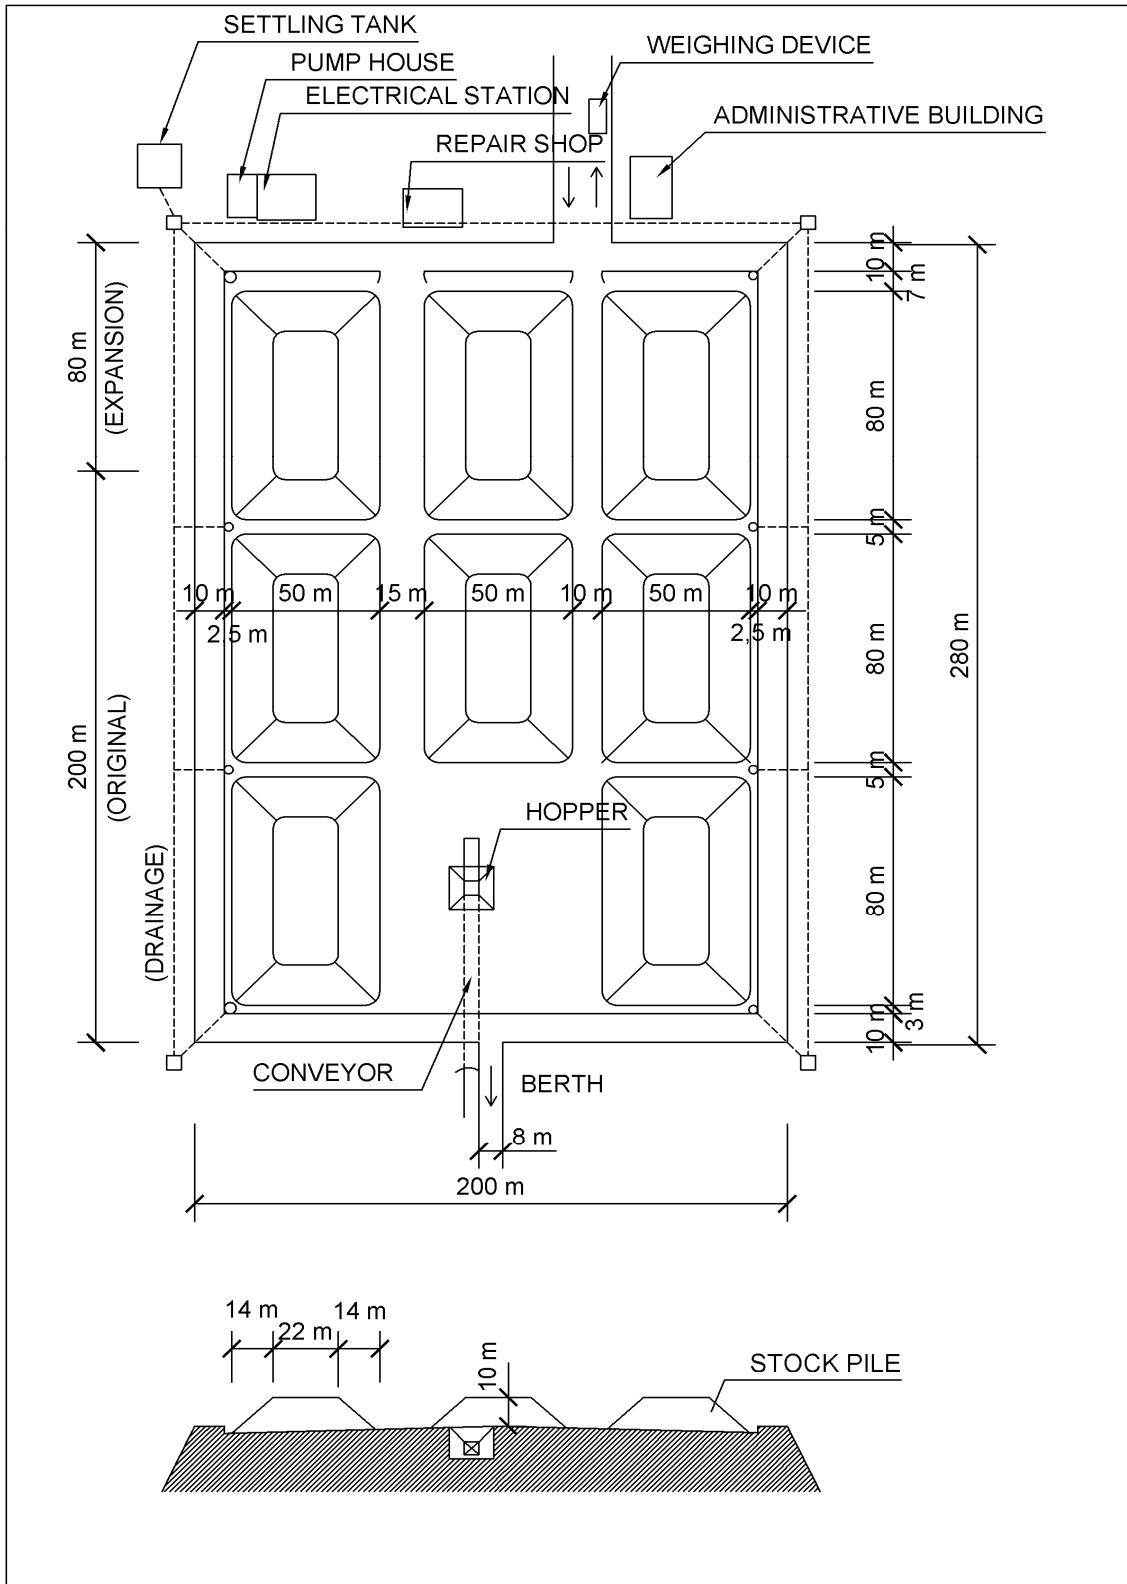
Coal Stock Yard Expansion and Terminal Facilities
